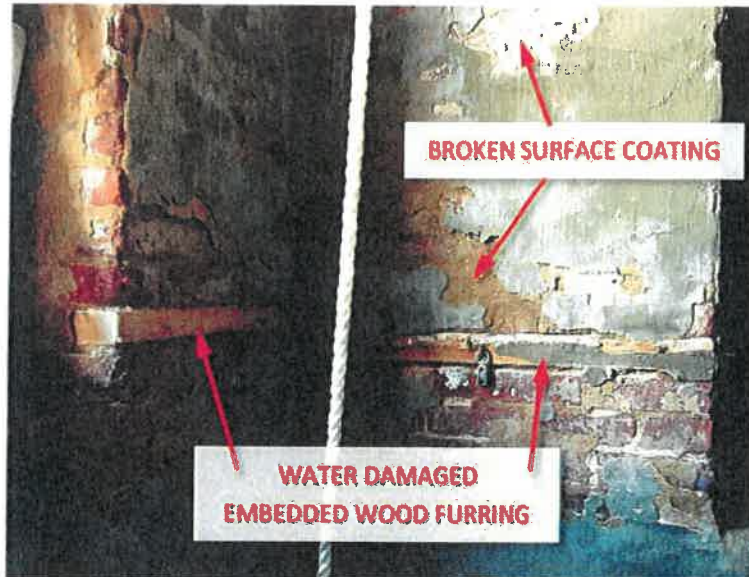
Water Damaged Wood Boards Embedded in Brick Wall
